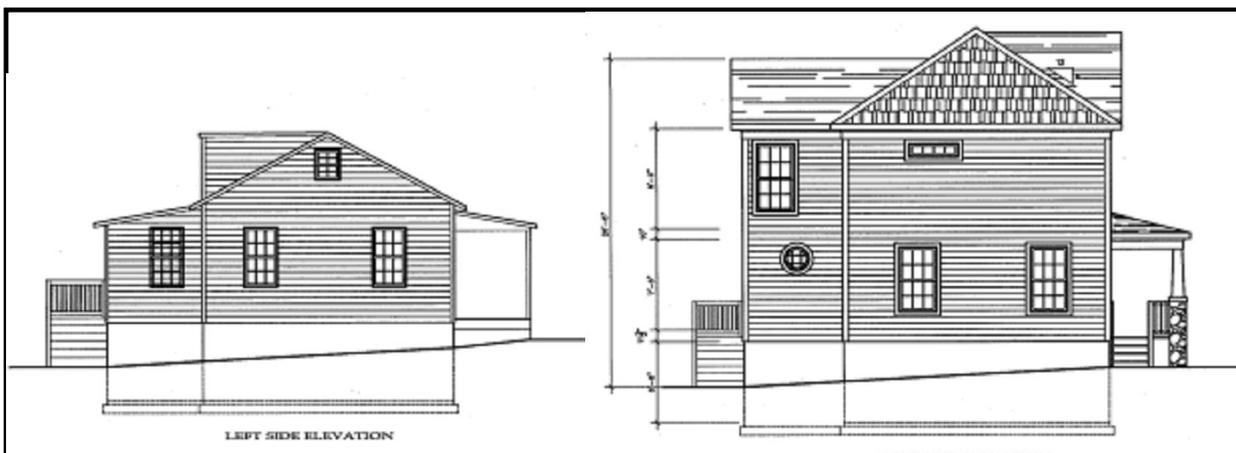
Side by side comparison, south side elevation existing and proposed. Source: Applicant.
